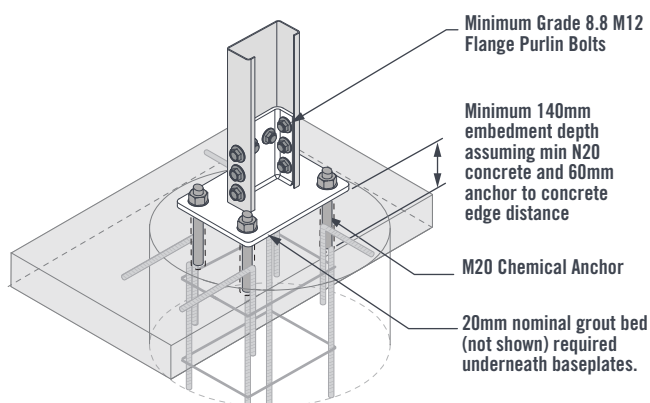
INTERNAL COLUMN WITH SLAB
